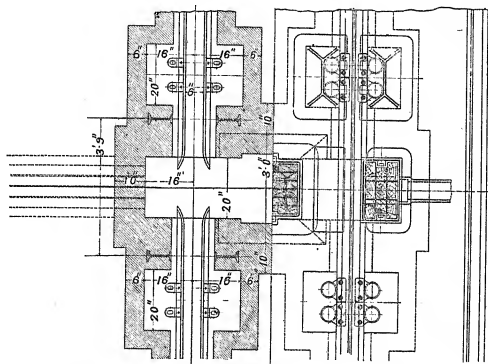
Section insulation and sump pit in Bournemouth conduit system.
